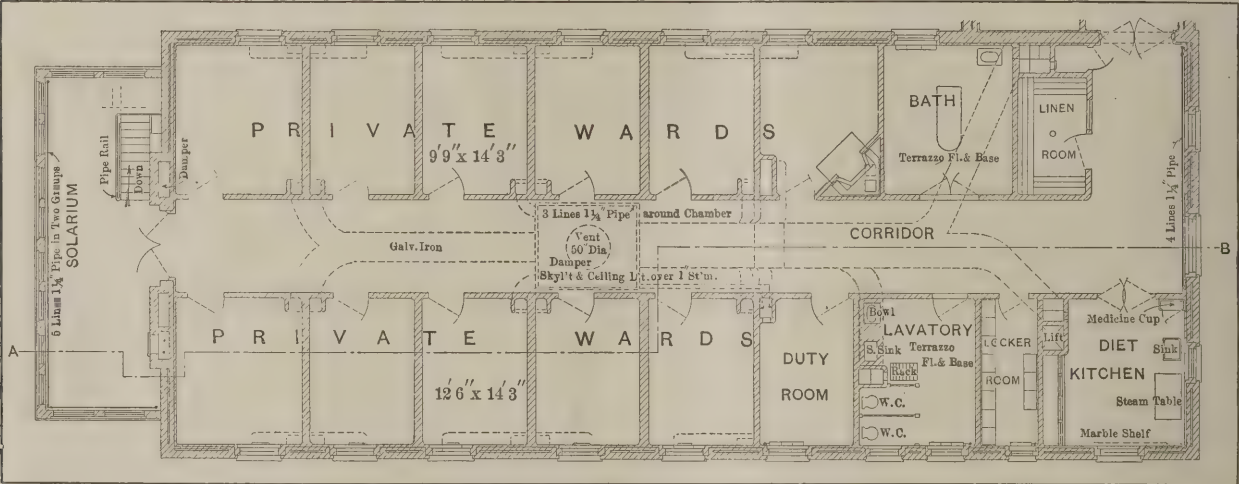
Second-Floor Plan, Showing Details of Heating System.
